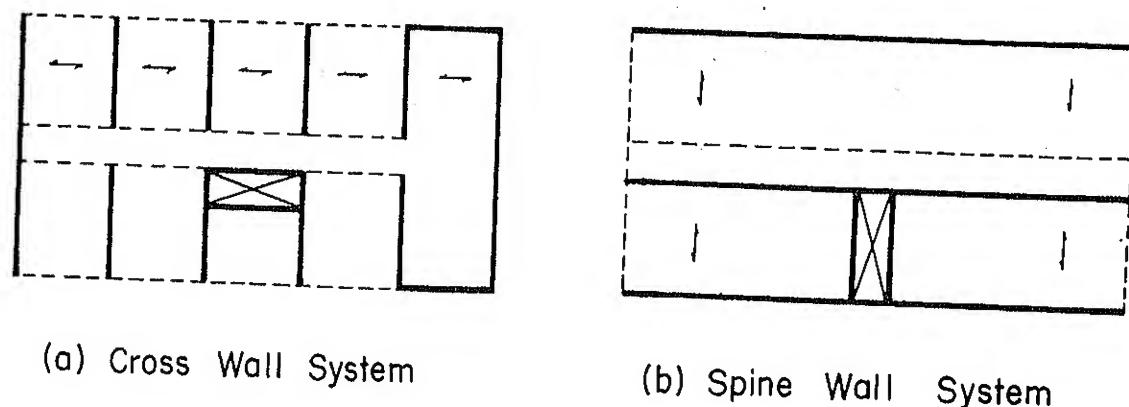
Idealized Plan Arrangements of Structural Wall Panels in Large Panel Structures
